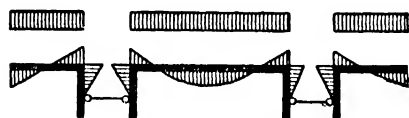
Structural diagram of a ribbed panel when the joints have been grouted with concrete
